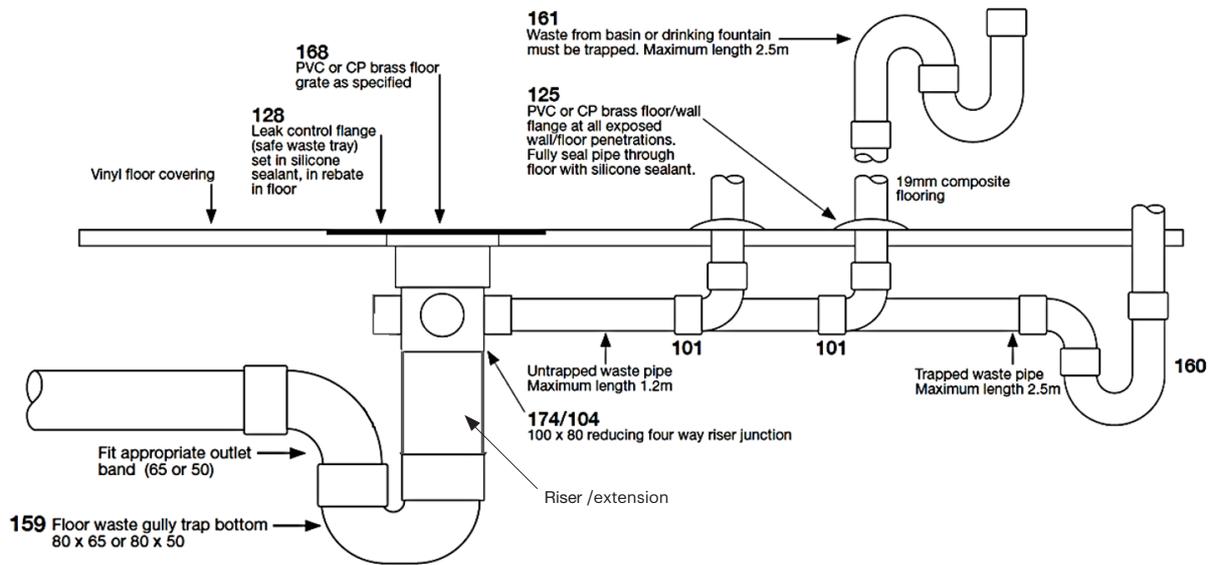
Typical Floor Waste Gully Design & Installation Requirements
